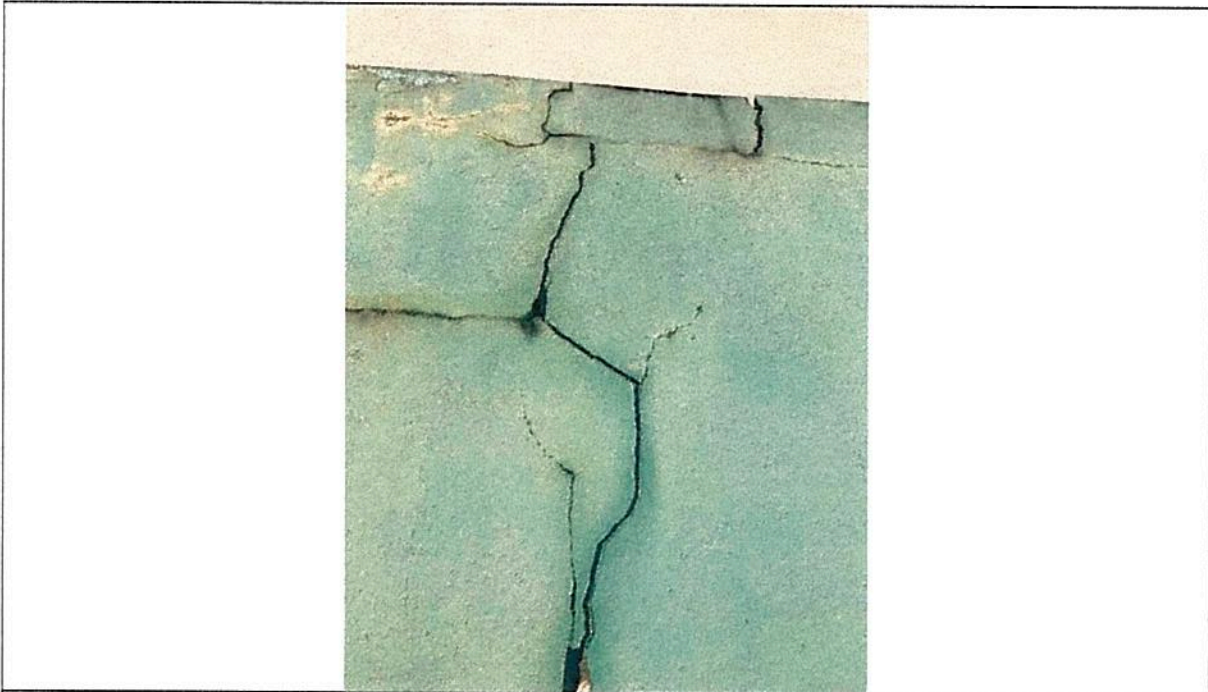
Wide cracks (horizontal and vertical) at CMU wall under North-East part of the building. East side of the N-E corner.
